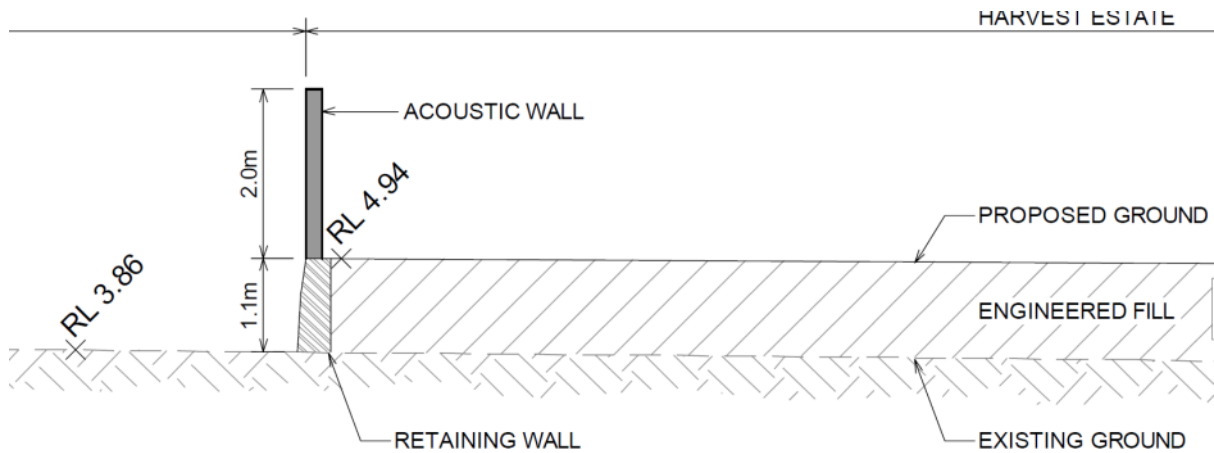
Development Site Layout and Barrier Scenario 1 Sketch (Not Scale).
